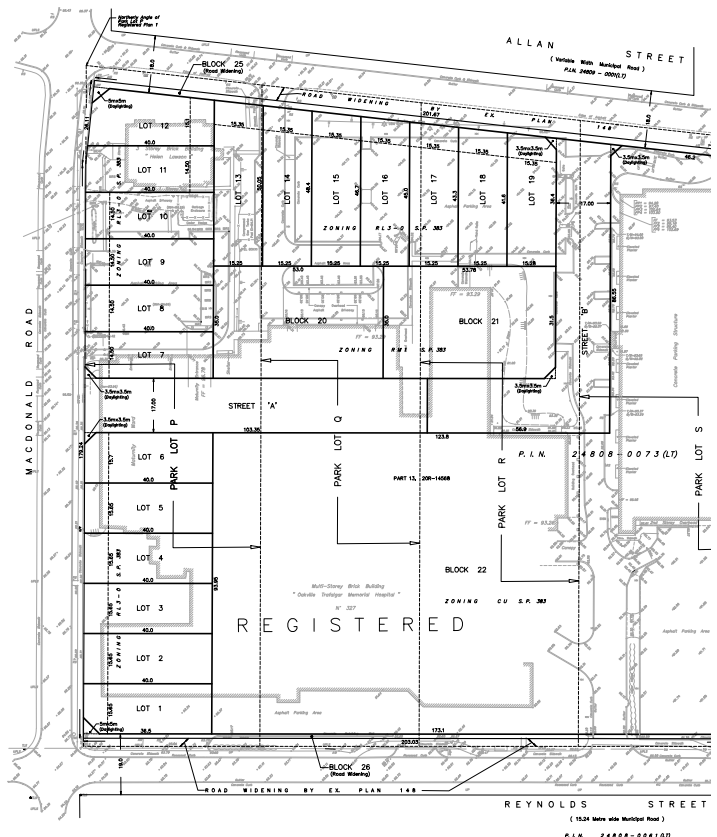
Draft Plan of Subdivision of Residential Block, 2017 (Cunningham McConnell Ltd)
